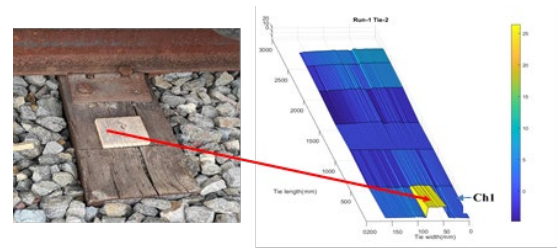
Reconstructed profile with block of known thickness (23 mm) (BNSF yard test)
